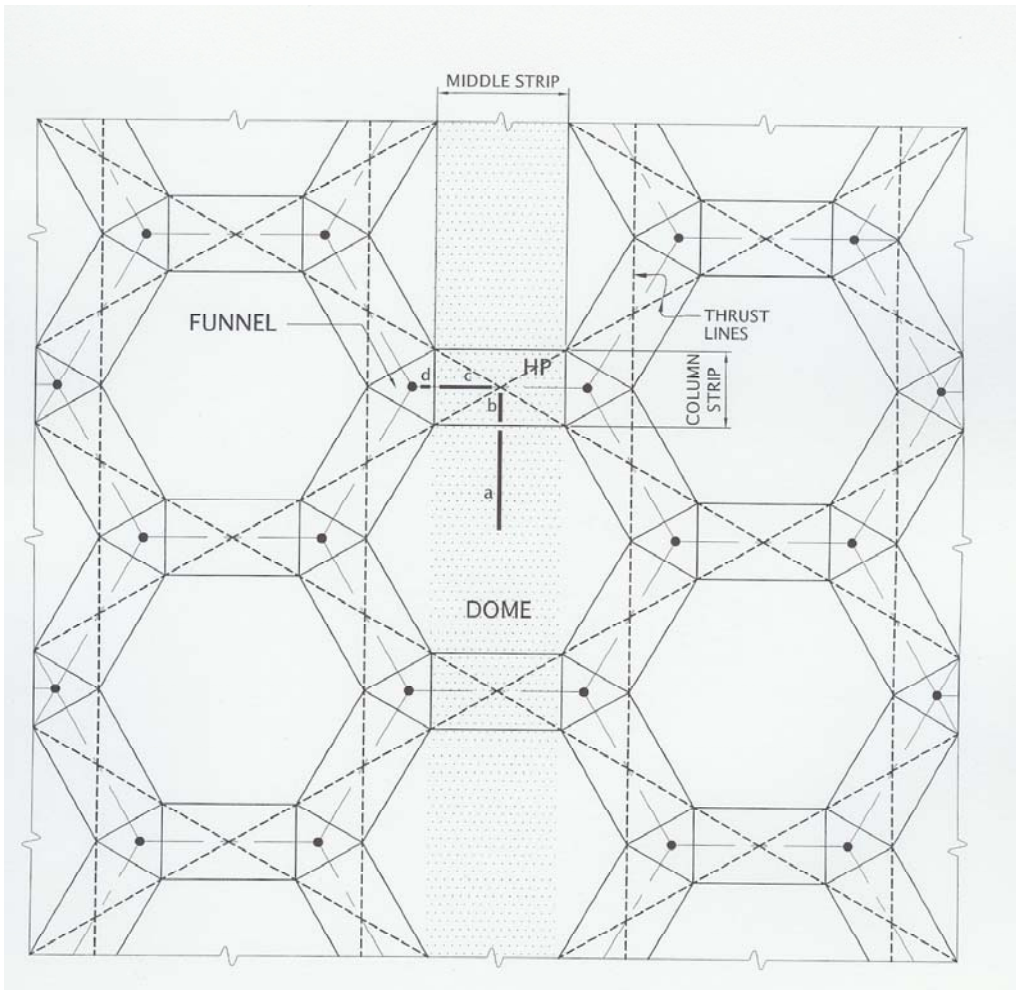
Structural membrane configuration generated for a hexagonal column plan.
